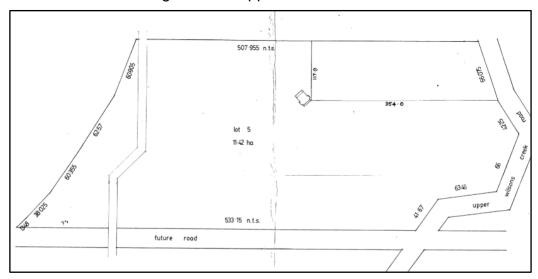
site plan of BA 6.1983.2164.1 showing approximate location of the dwelling approved by this BA. No shed or second dwelling is located on the plans
